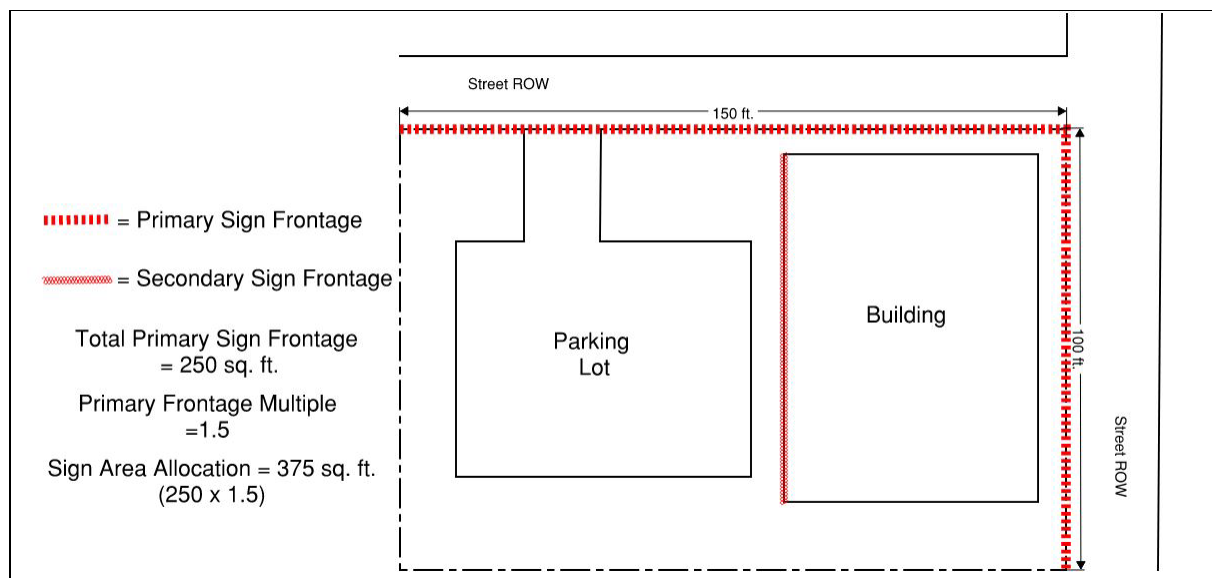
Sign Frontage and Sign Area Allocation
